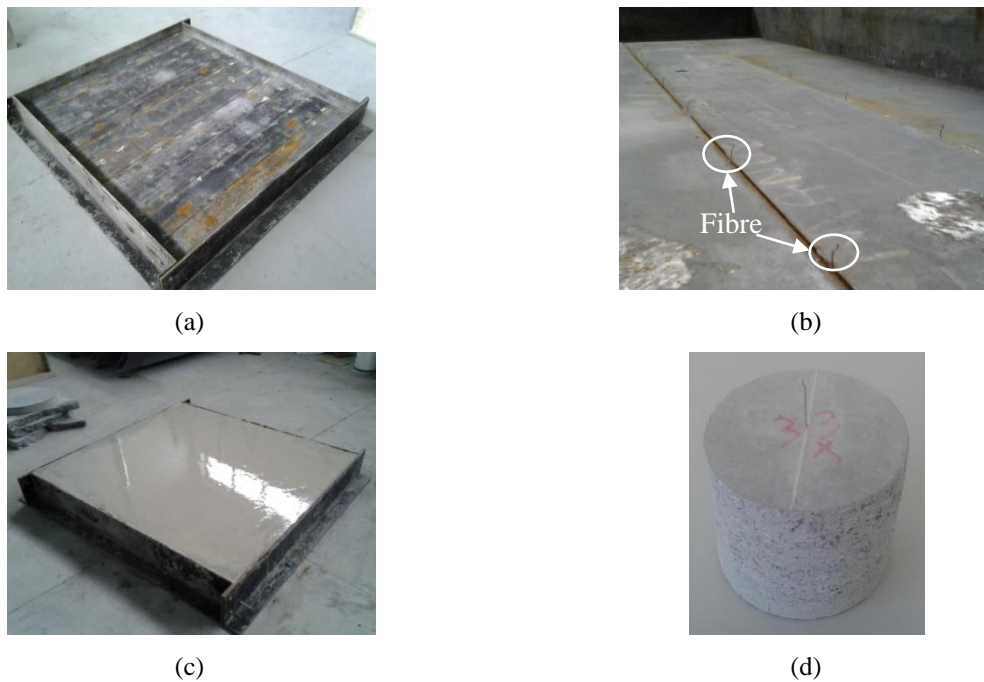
Production of the specimens for fibre pull-out test: (a) casting mould, (b) fibre positioning in the mould, (c) casting panel with SCC, and (d) extracted pull-out specimen.
